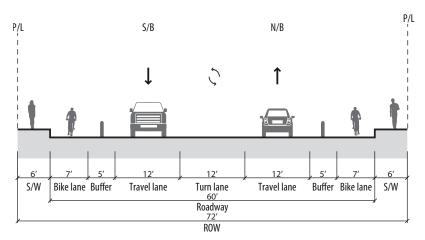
Typical Cross-Section for Glendora Avenue, Ada Avenue to Route 66.
